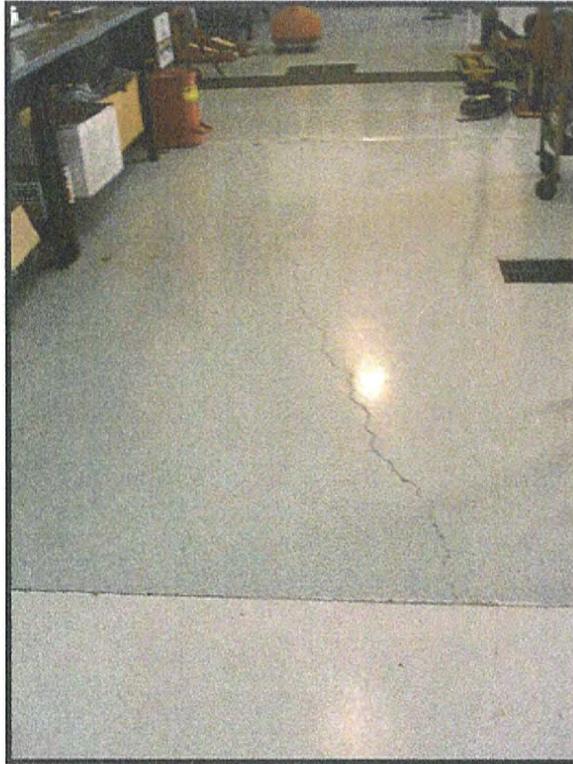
Thermal cracking along 4" ground slab in service bay No. 2.
